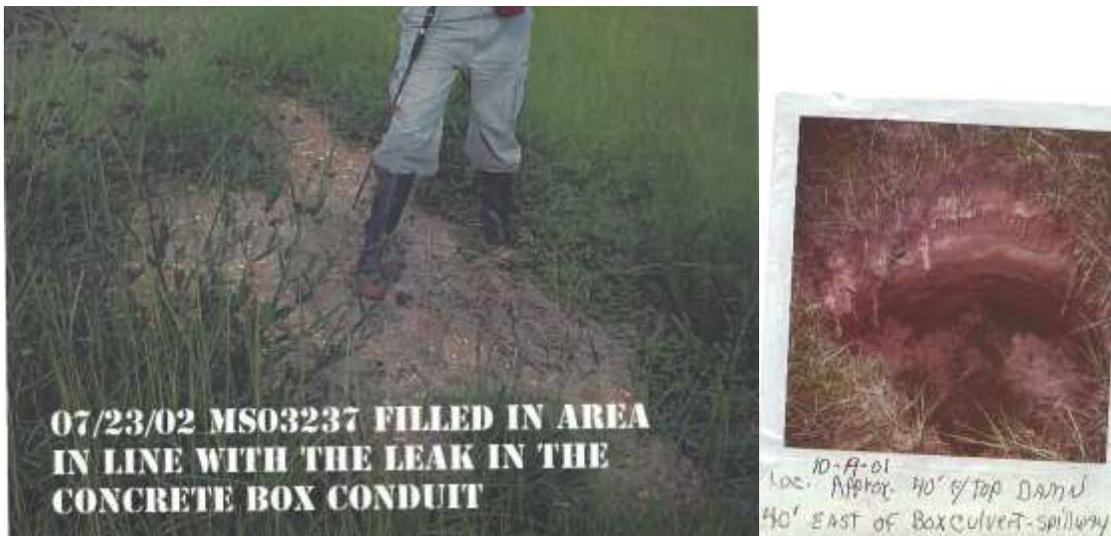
Photo of Sinkhole Before and After Backfilling on the Lower Downstream Slope Bench. See Figure 7 for Approximate Location on Cross Section.
